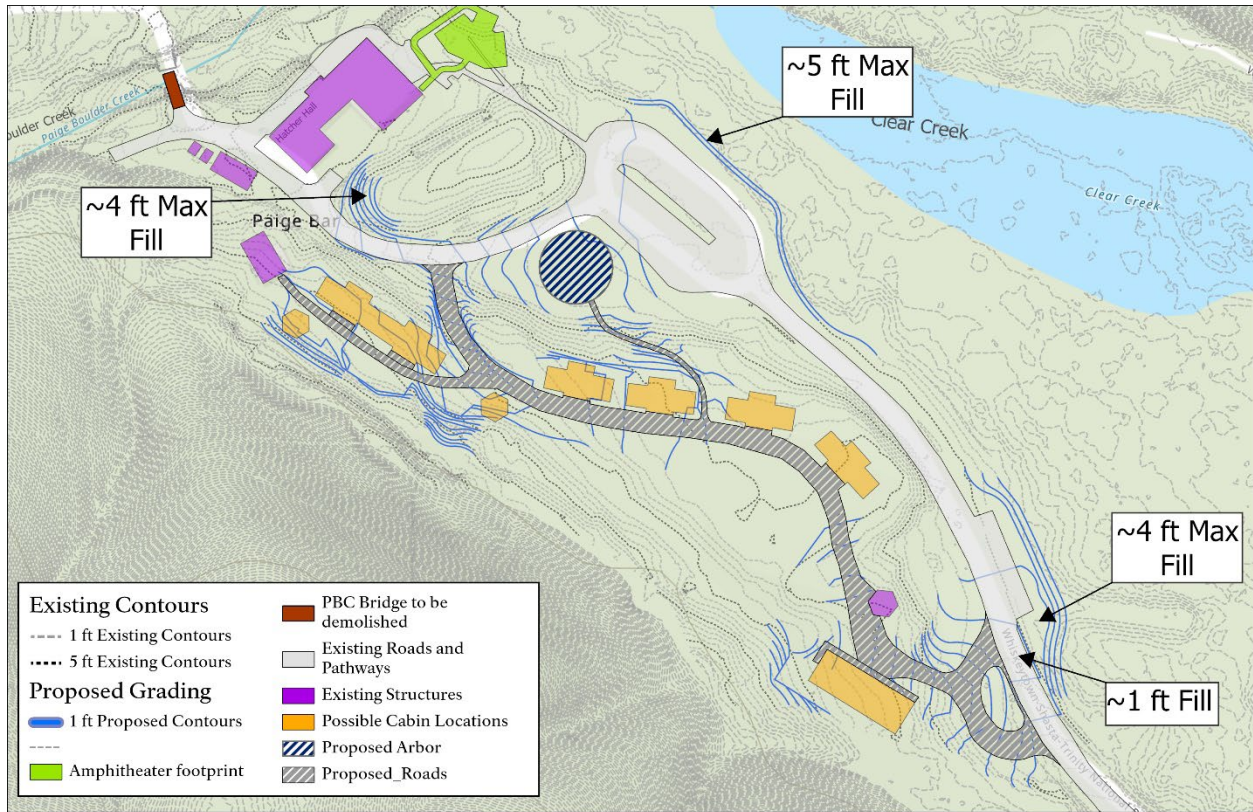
Conceptual schematic of proposed utility and road development site plan for WES.
